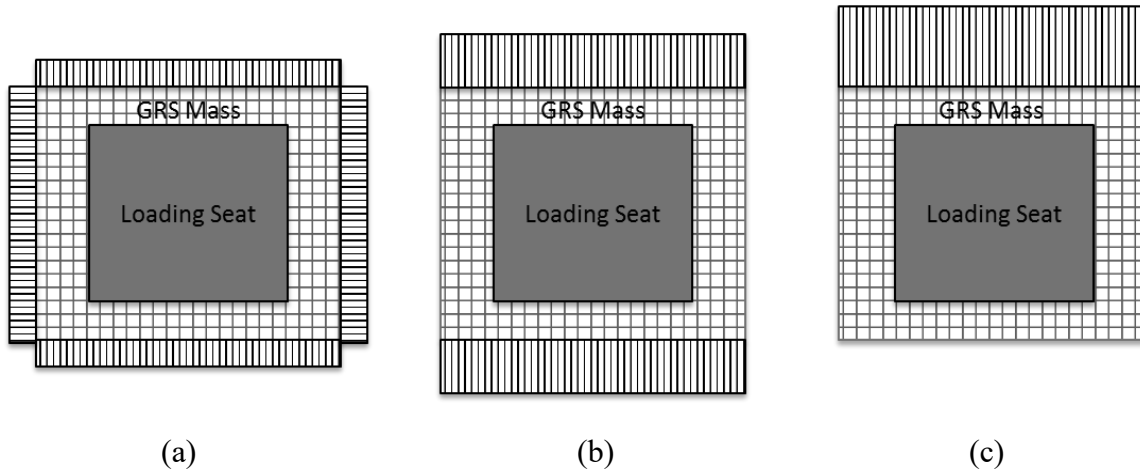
Typical deformation diagrams in plan: (a) square pier; (b) fixed-wall pier; (c) abutment.
